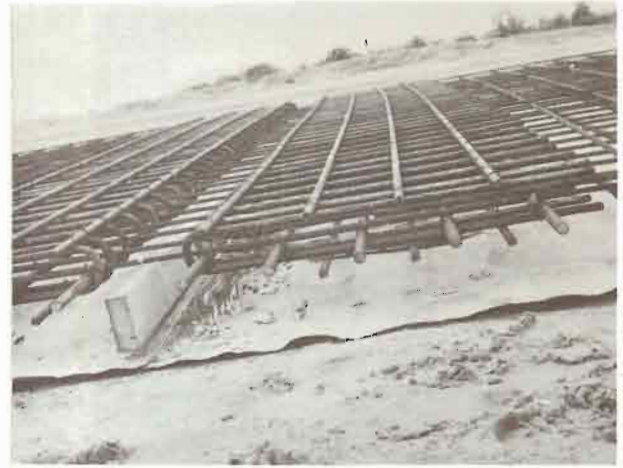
Side view of a future joint showing tendons, transverse reinforcement, hairpins, timber strip, etc. (See also Figure 45.)
